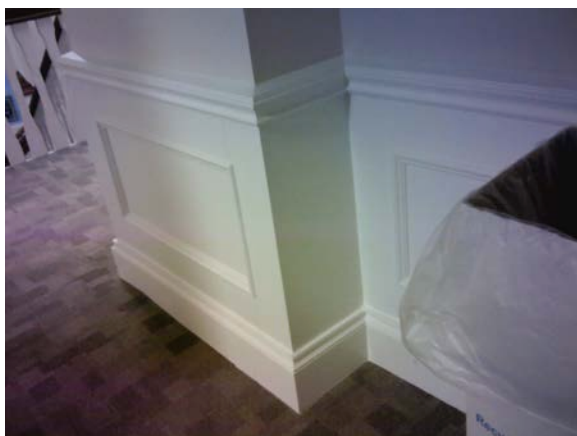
Room F18. The image shows thermal bridge at the junction of first floor floor line and external wall.
